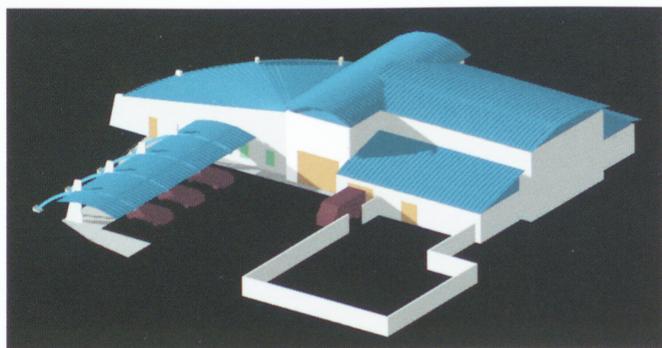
Artist's concept of the technical building to be constructed at Array Operations Site (AOS).
